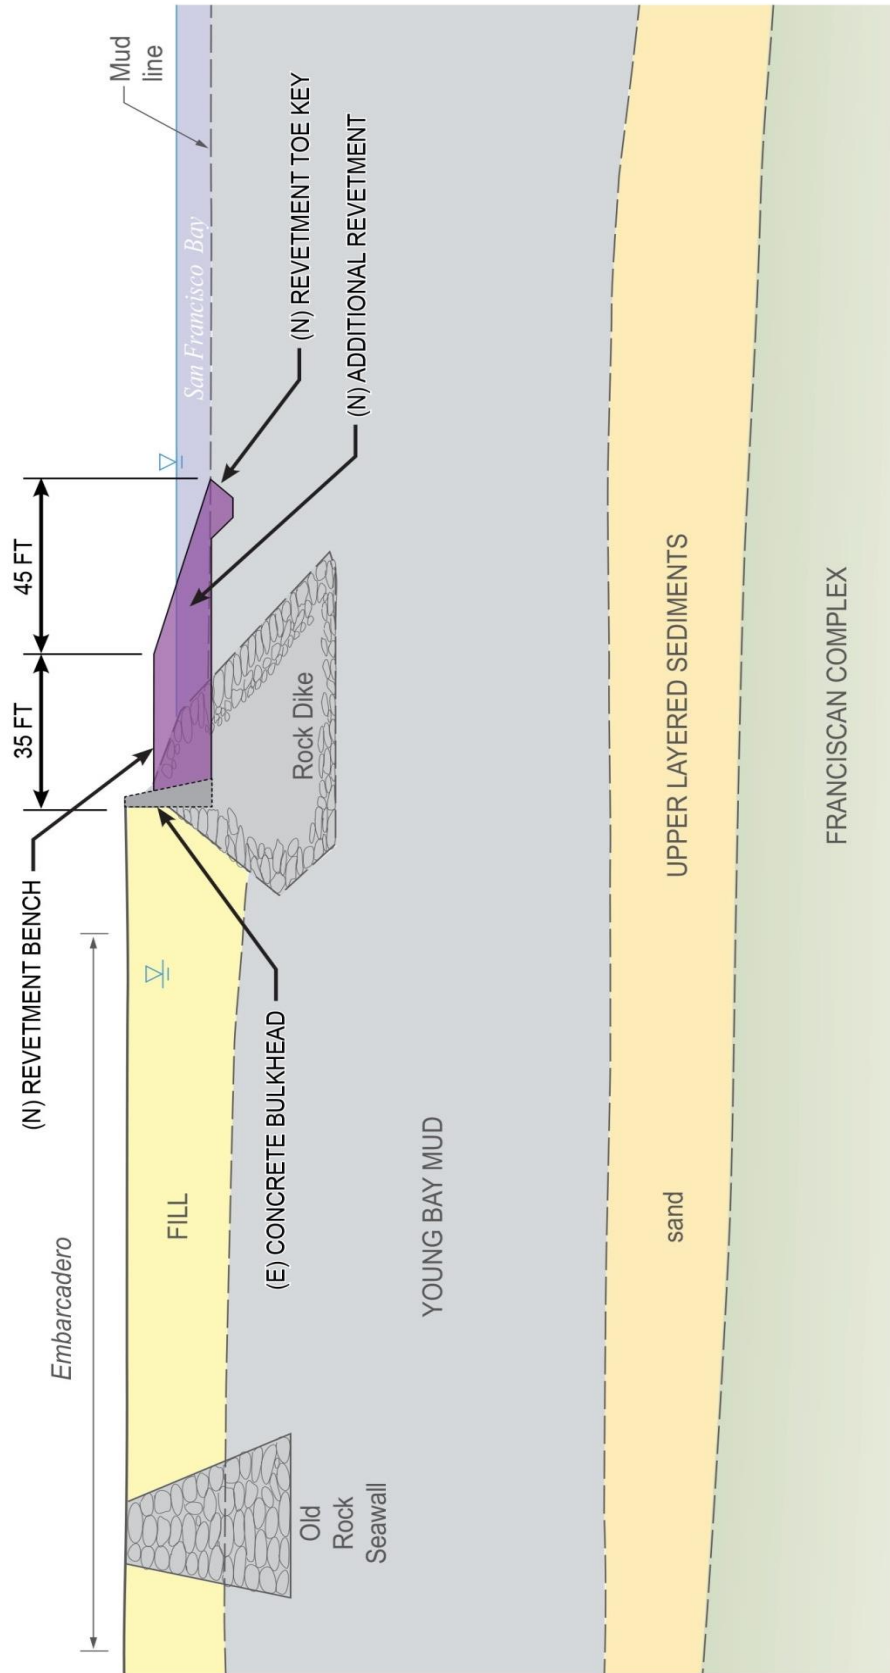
Typical Section Bulkhead Wall Retrofit (S-4) Revetment, Bayside
